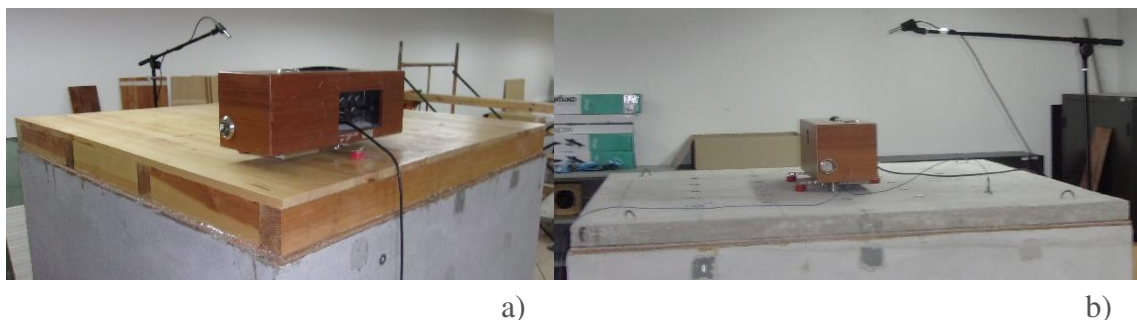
Simplified impact sound insulation test of: a) traditional wood floor; b) 60 mm reinforced concrete floor.
